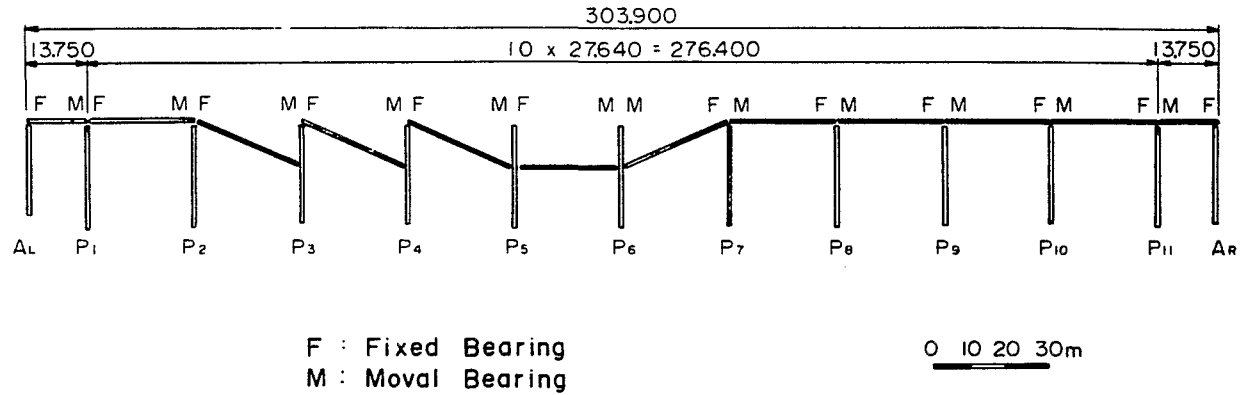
Collapse of spans of Showa Bridge in 1964 Niigata, Japan earthquake (Hamada, 1992a).
